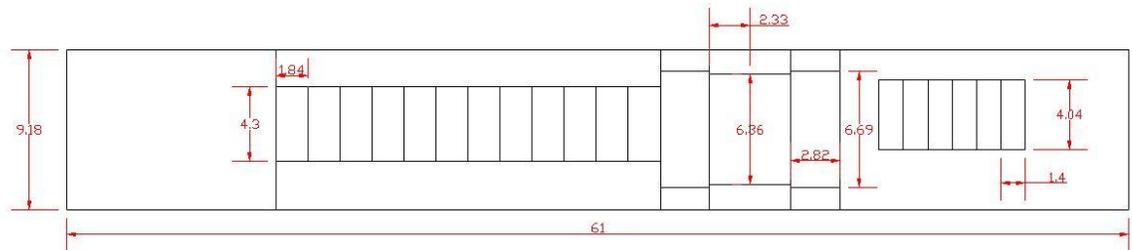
Side 3 of the building, facing North East drawing details dimensions in feet
